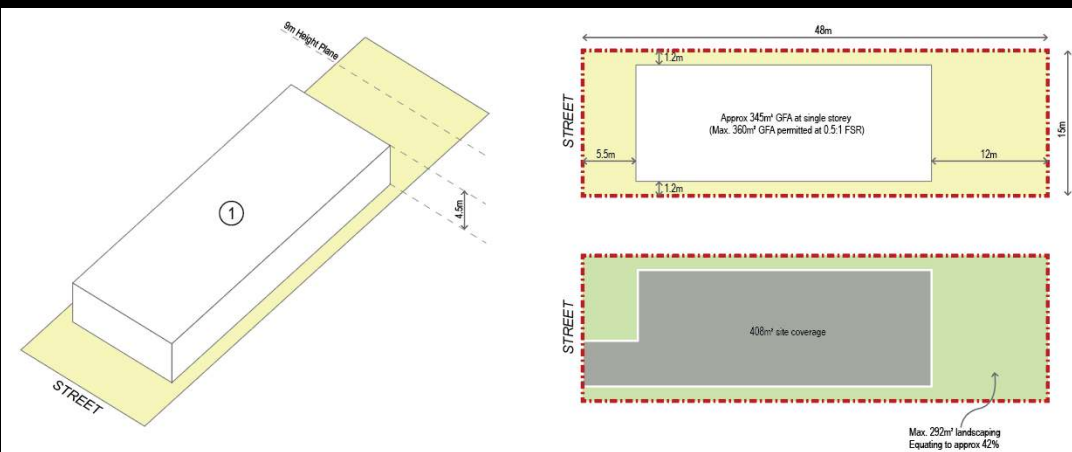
Sample dwelling house with reduced FSR (0.5:1)
